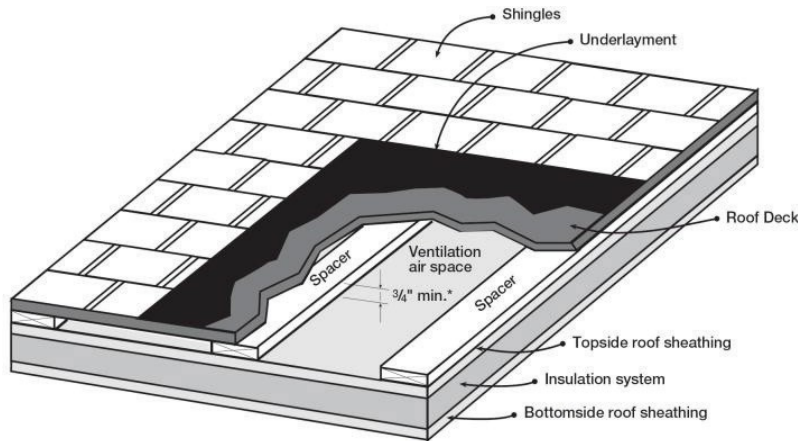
Figure B: Vented roofing assembly created by installing spacers between the rigid insulation and the nailable roof deck sheathing
